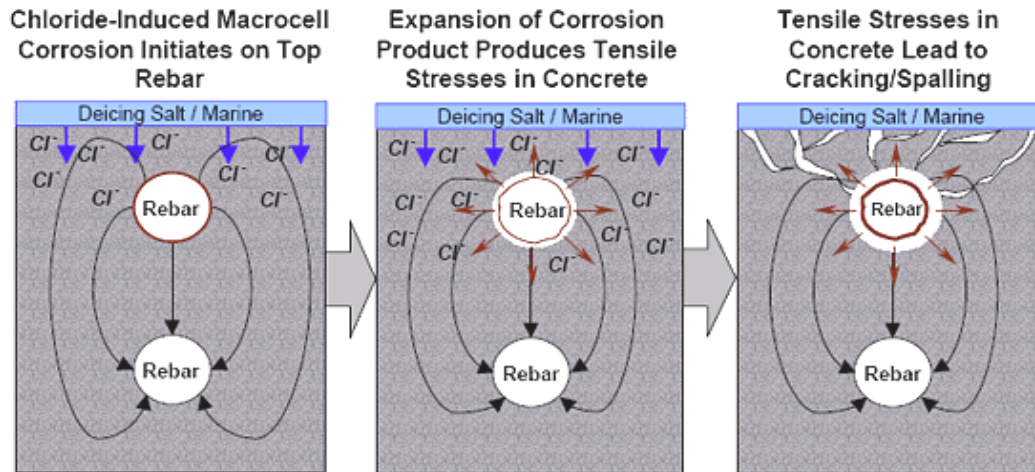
Cracking and Spalling of corrosion effected concrete
